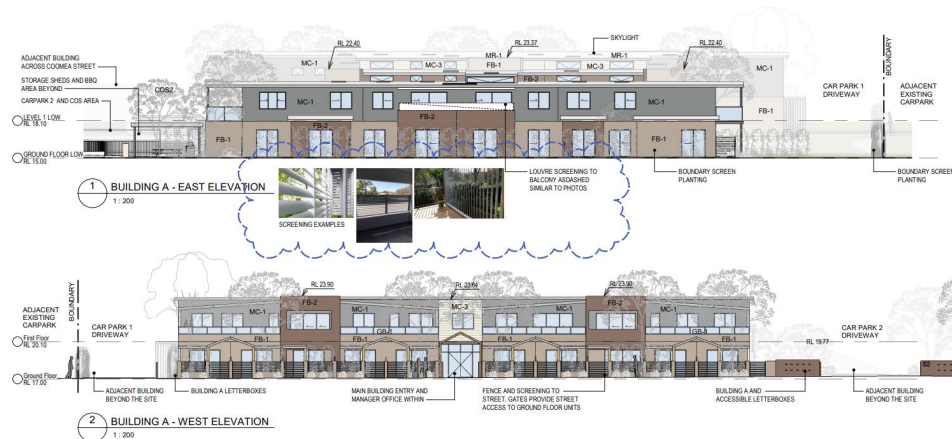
East and West Elevation – Building A (Dwg No. DA06)
